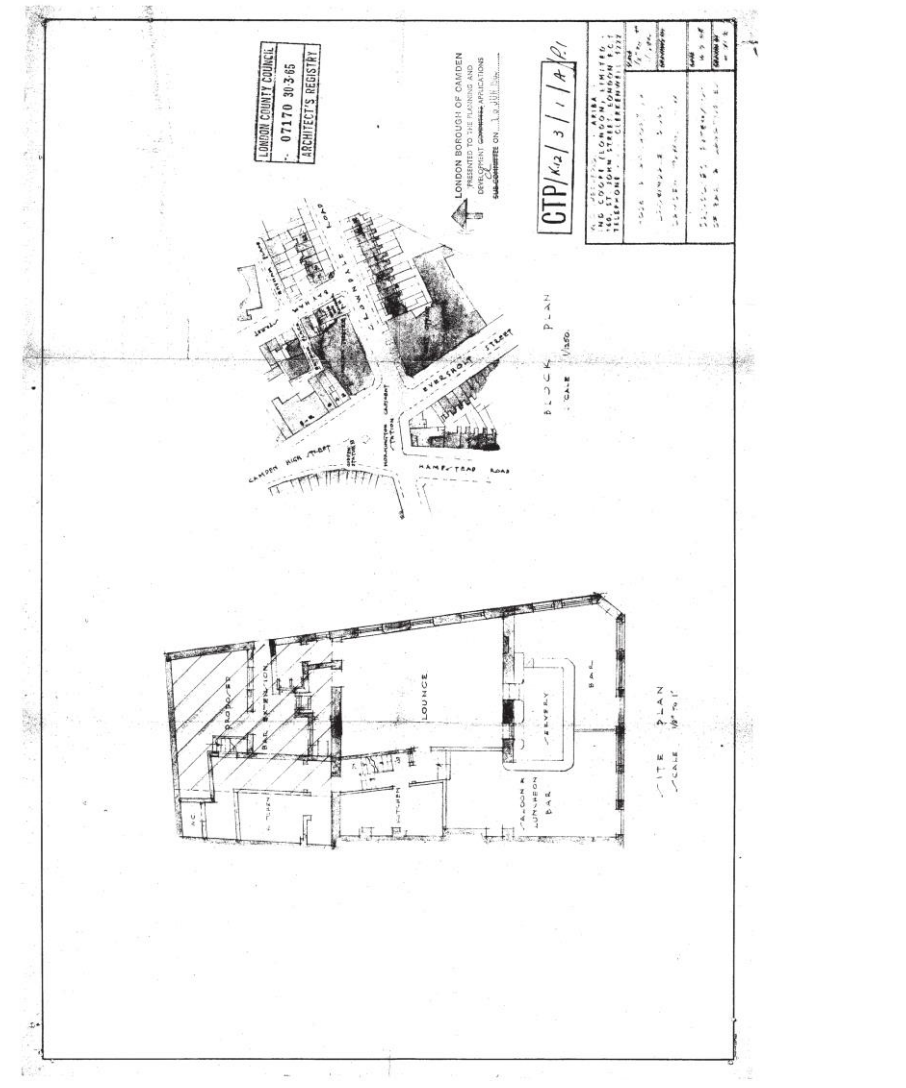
1965 Planning application drawing of floor plan – proposal for a bar extension to the rear of the building
